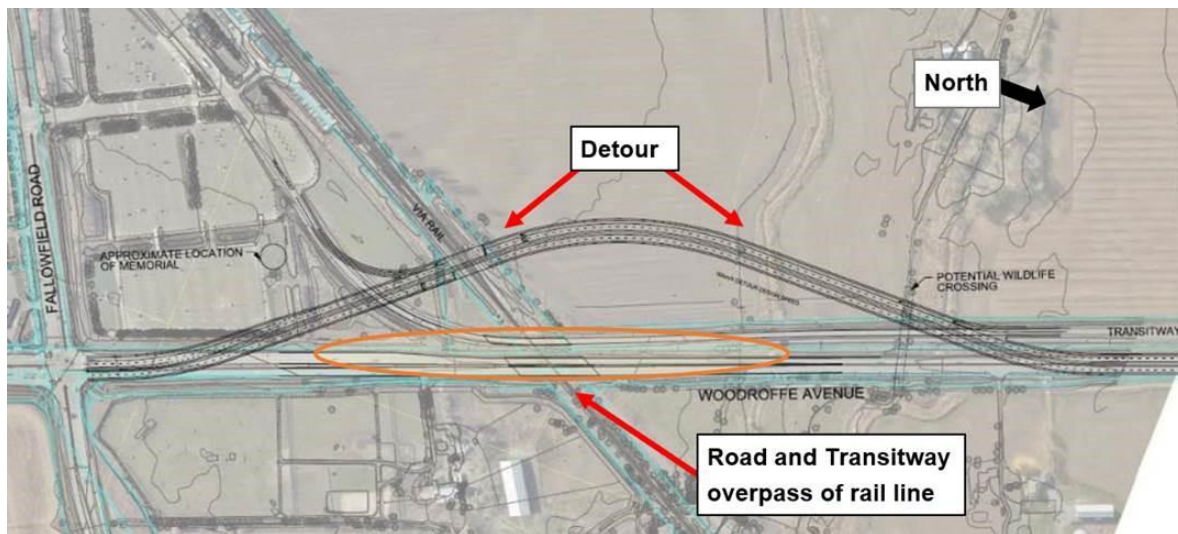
Woodroffe and Transitway: Overpass and detour on west side
